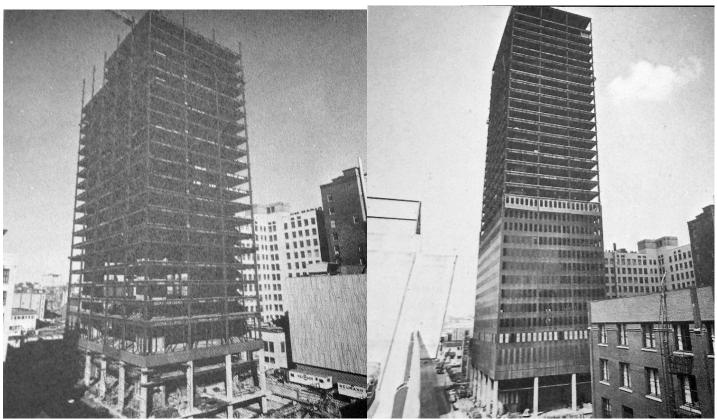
Construction progress photos; left, looking north; right, looking north with cladding to 15 floors (Structural Report "Ruan Archives")
